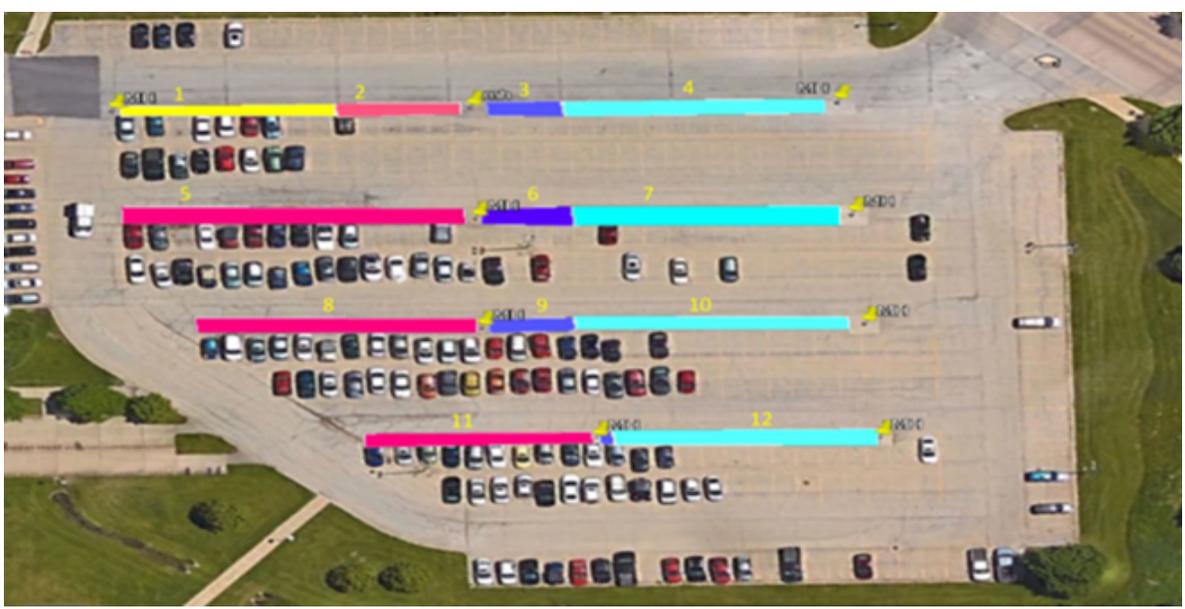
Proposed swale sections overlaid on existing plan view of South Parking Lot
